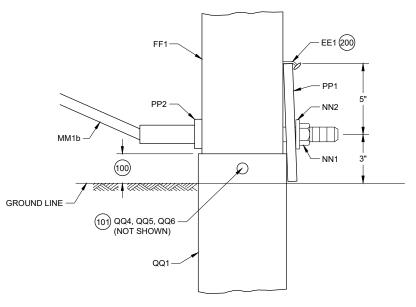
## DETAIL "B" STEEL PIPE ASSEMBLY (BEAM GUARD AND W BEAM END SECTION NOT SHOWN)
